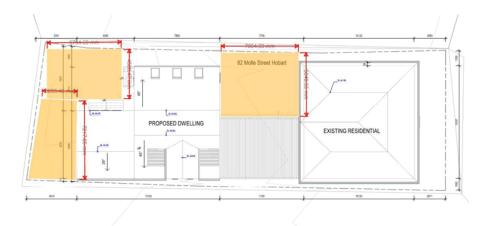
Applicant Site Plan (BeeHive Design, 2021)
